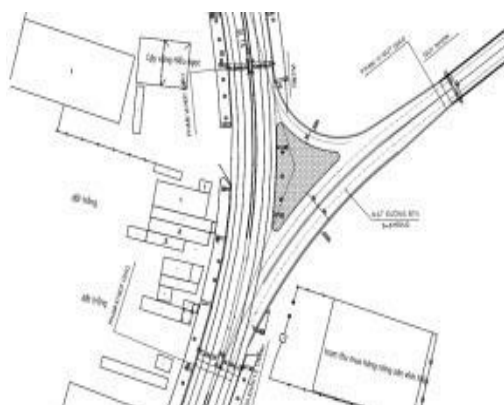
shows the design of the intersections between NH19 and the bypasses in which traffic and safety control measures included.
